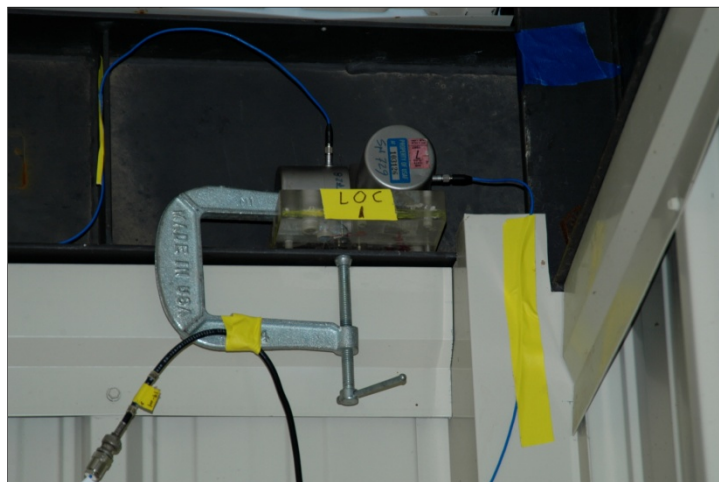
Accelerometer Mounting at Building 6429, Fort Sill
